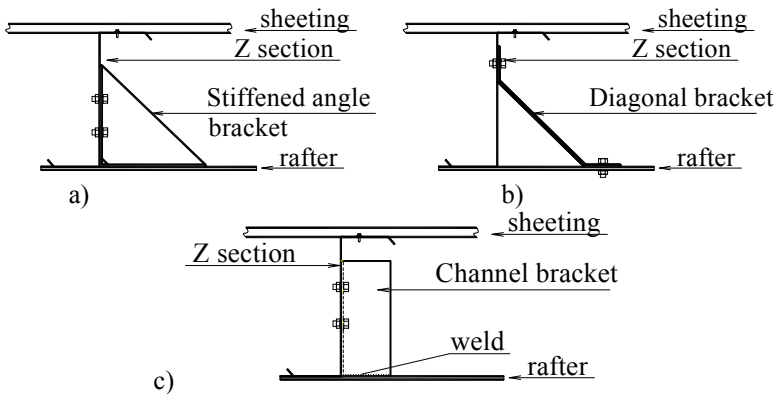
Connecting details providing lateral-torsional restraint (details a) and b) from Seeka & Murray (2008))
